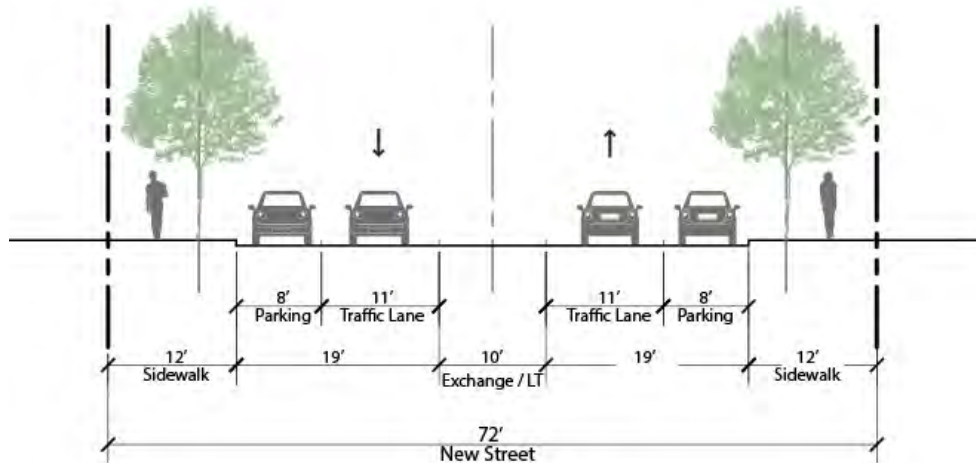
Commercial Core New Street with Center Turn Lane Typical Cross-Section.
